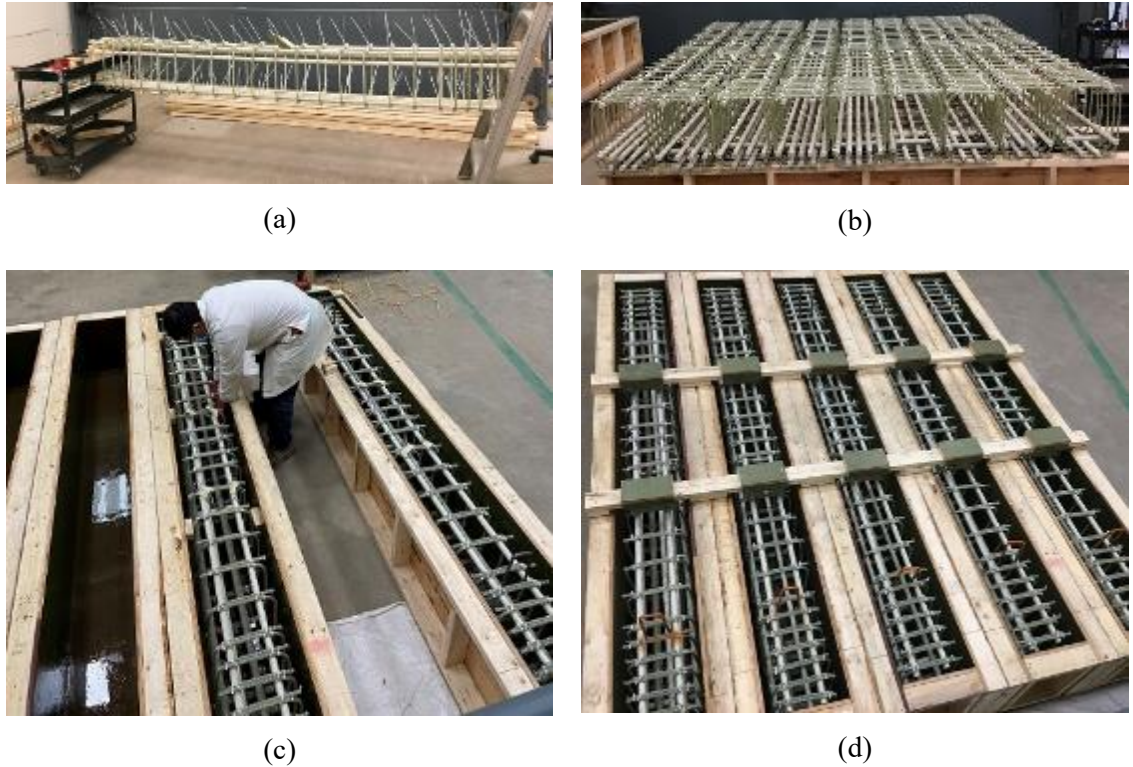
GFRP beam fabrication: (a) cage assembly (b) cages for all specimens (c) placing cages in formwork (d) assembled cage and formwork before concreting
